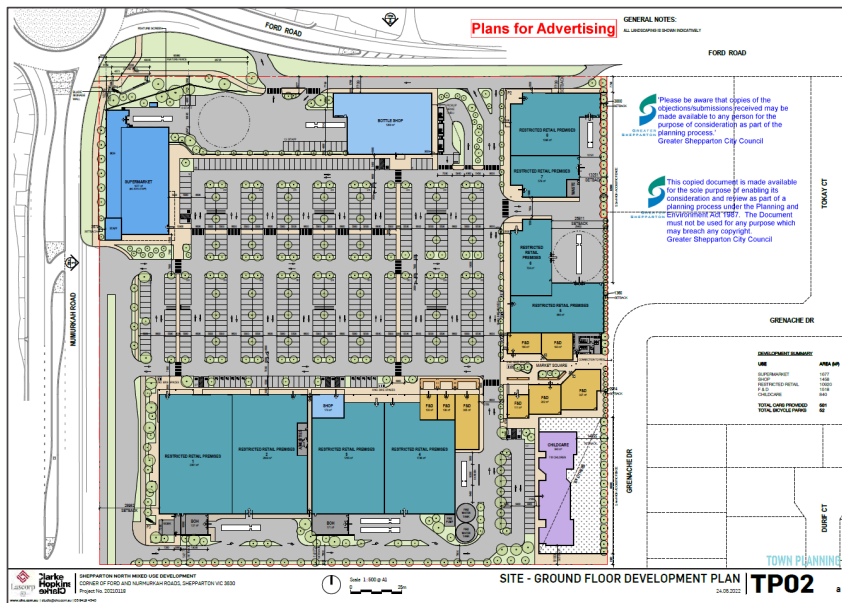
Advertised Plans for Planning Permit Application 2022-189
